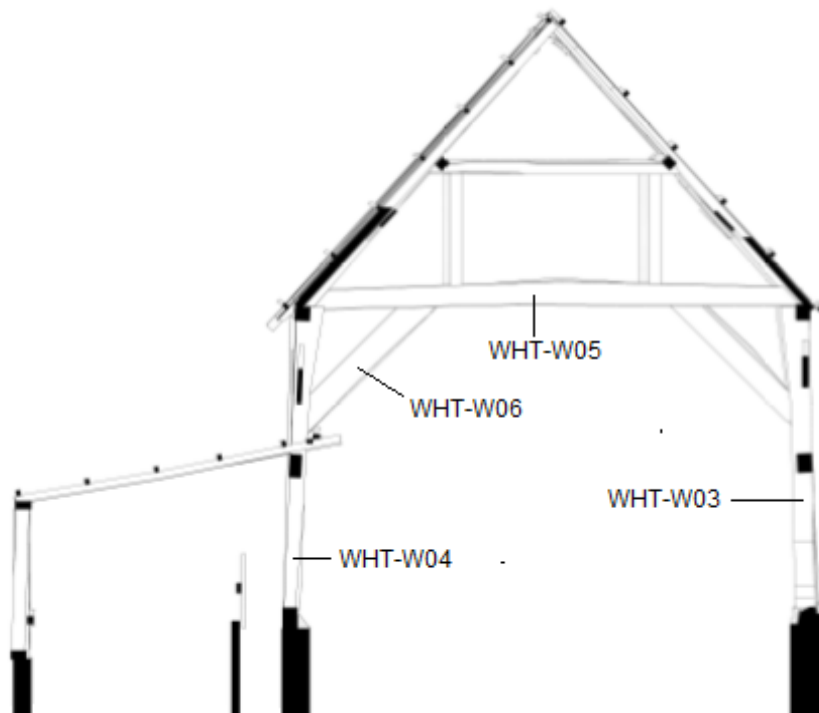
Section through Truss 2, east face, showing the sampled timbers, WHT-W03-06 (after ATD London Ltd)
